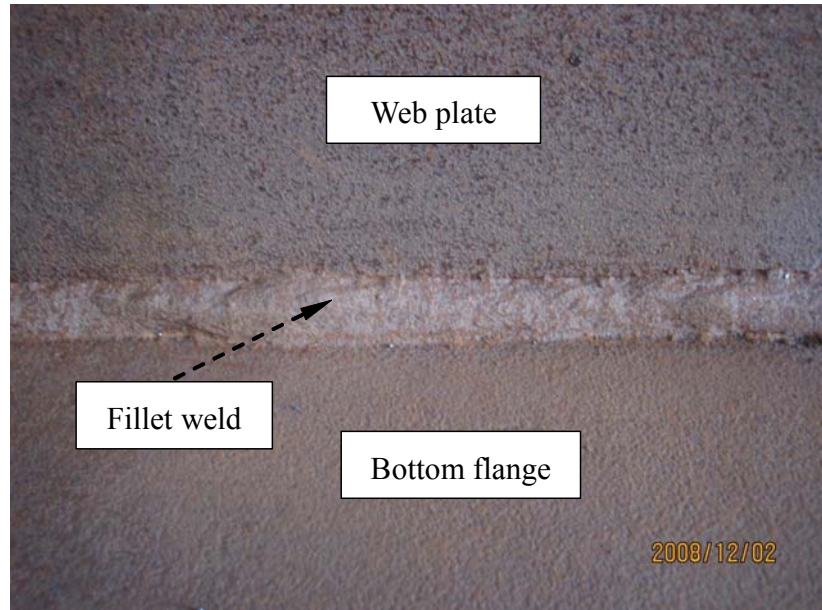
Welded T-joint between web plate and bottom flange
